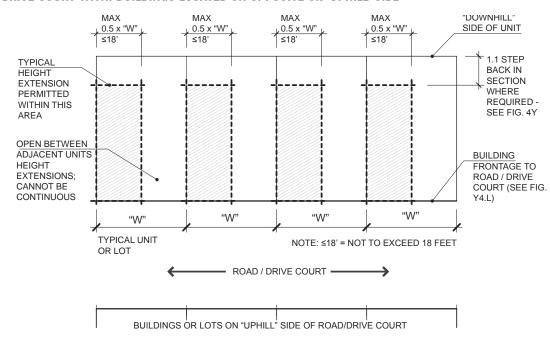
PLAN DIAGRAM OF UNITS/LOTS DESCRIBED IN FIGURE 2.15 ON DOWNHILL SIDE OF ROAD OR DRIVE COURT
